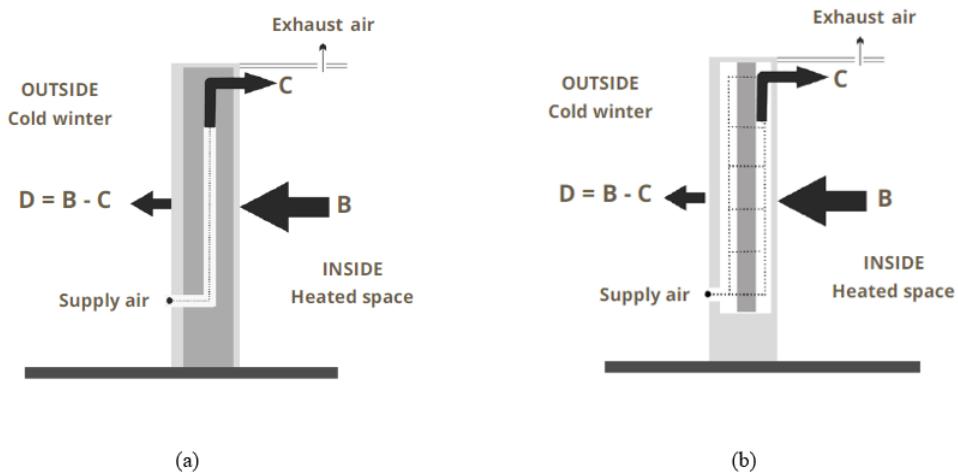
(a) Parietodynamic wall construction. (b) Permeodynamic wall construction (Imbabi, 2012).
